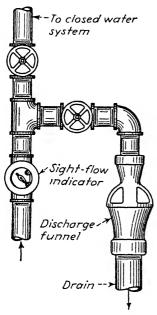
Use this piping arrangement for a closed cooling system. (Courtesy of Compressed Air Institute.)
